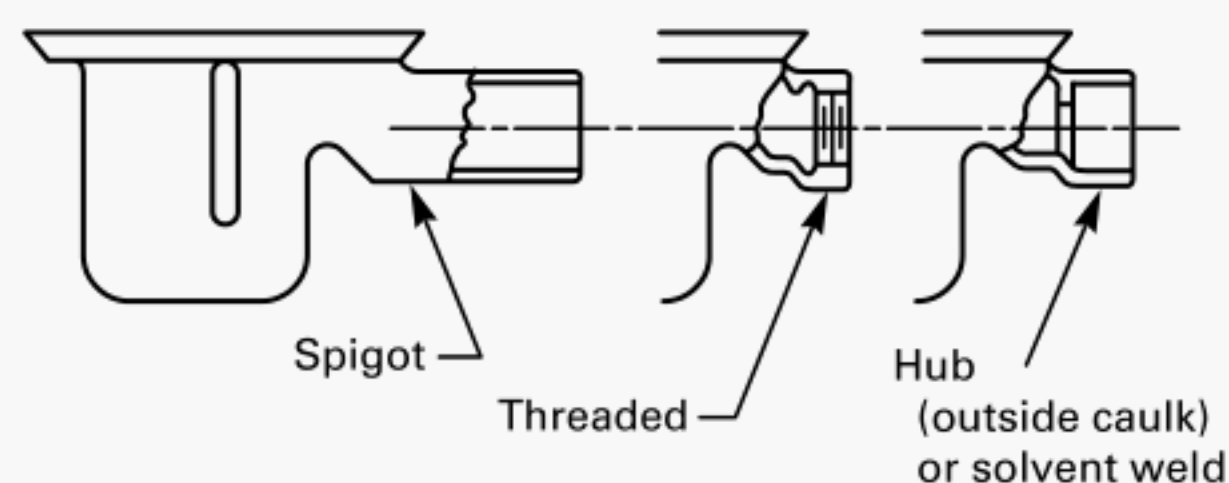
SIDE OUTLET INTEGRAL TRAP
